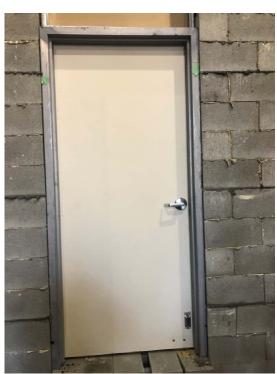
The unexposed face of the wood door test assembly prior to the fire test.
